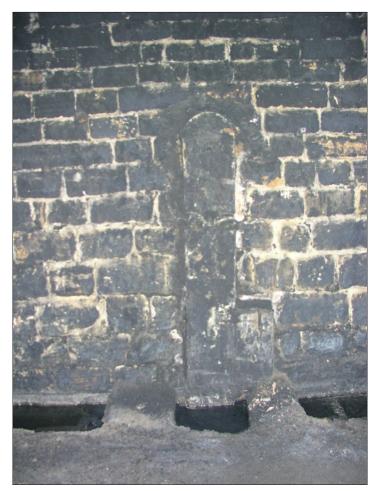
Woodhead Tunnel: Tall shallow recess in stone lining possibly for an earlier signal
